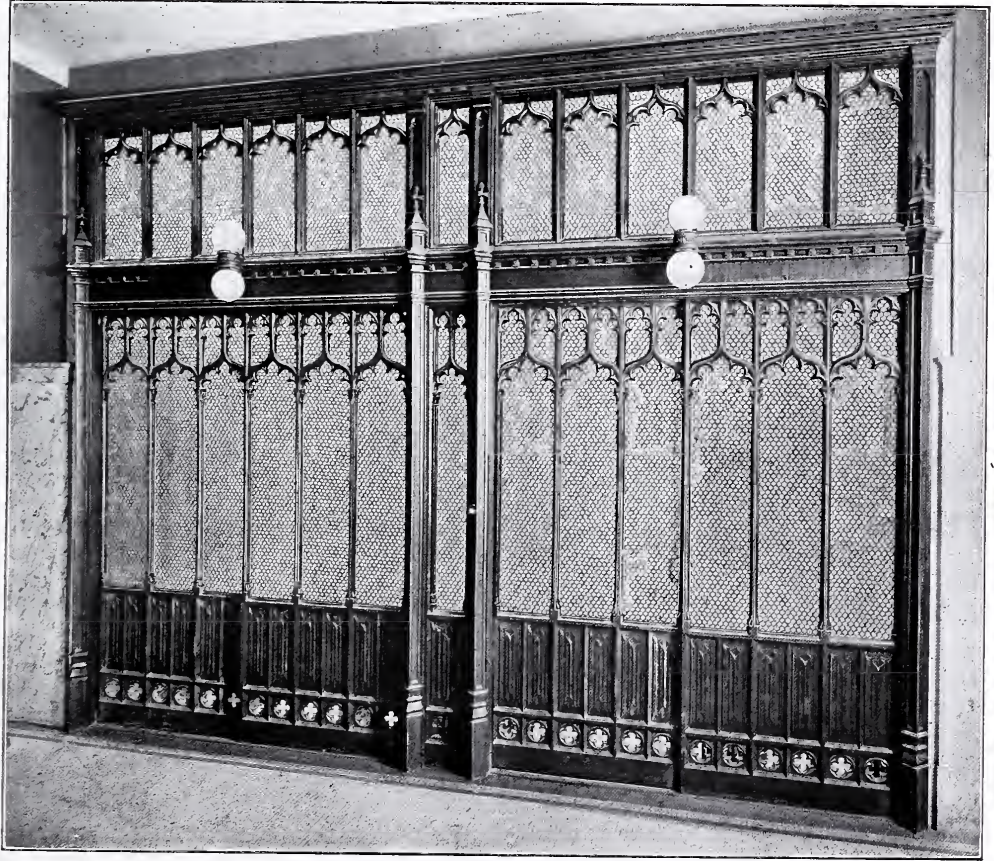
TYPICAL ELEVATOR ENCLOSURE, 2D TO 23D STORIES, TRINITY BUILDING, 111 Broadway, New York.
